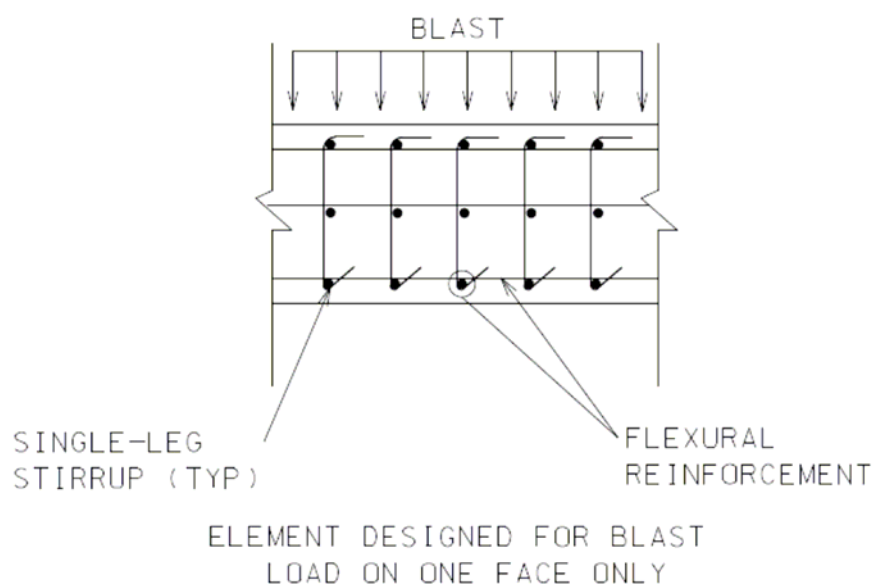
Placement requirements for Type A single-leg stirrups according to TM 5-1300 Update [4]
